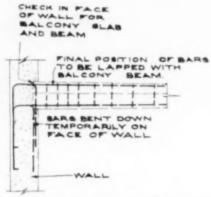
Arrangement of Reinforcement at Projections from Wall.
